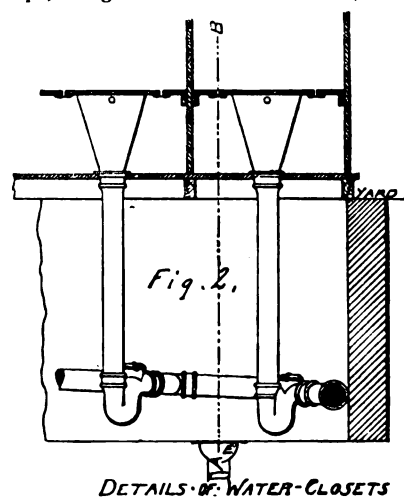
DETAILS OF PLUMBING IN A DIVISION STREET, NEW YORK, TENEMENT.
